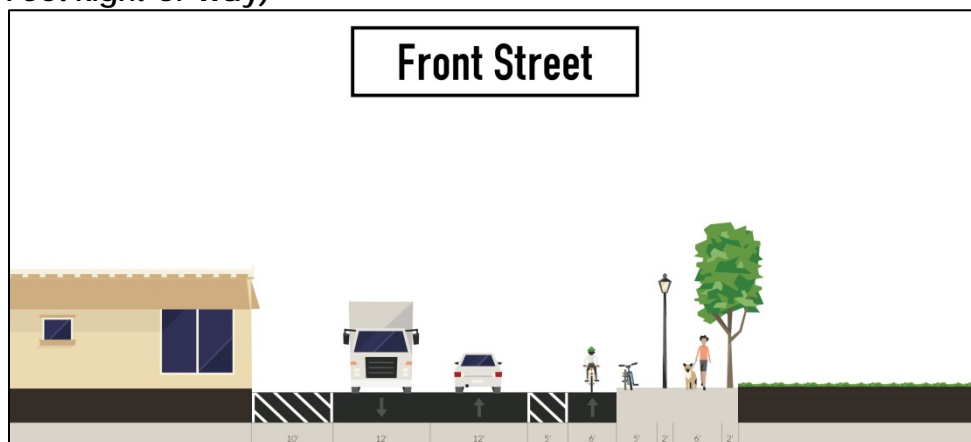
Front Street Cross-Section from Stillwell Avenue to US 101 – Alternative 2 (60 Feet Right-of-Way)
